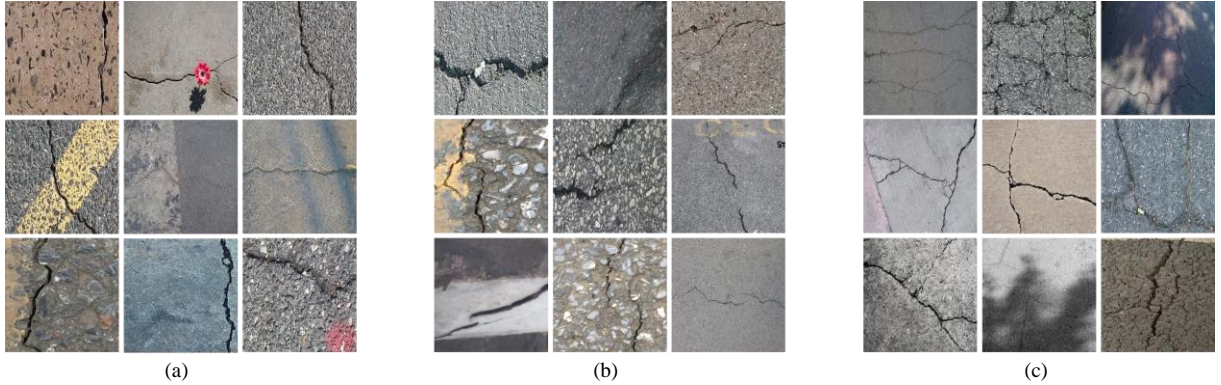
Dataset: (a) Single crack; (b) Fractured crack; (c) Reticular crack.
